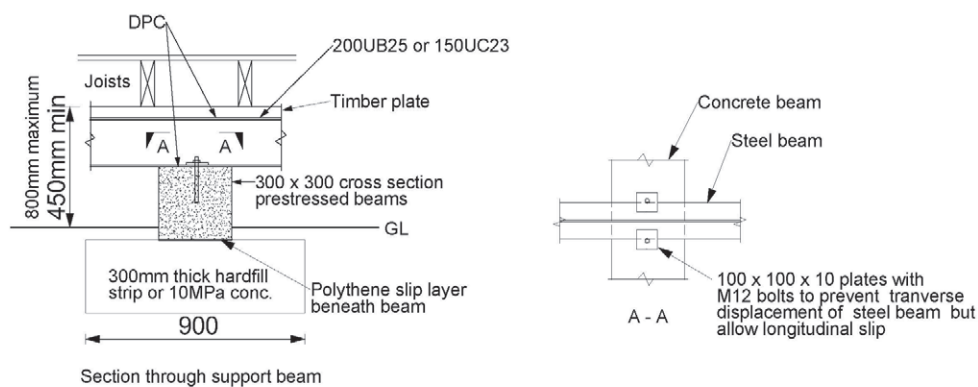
Type 3B surface structure – Section through pre-stressed concrete support beam and beam connection
